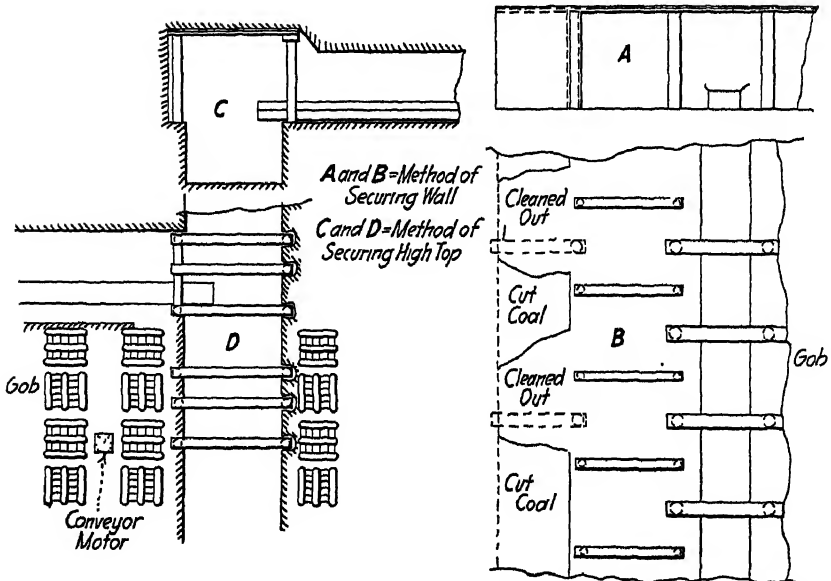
TIMBERING IN A LONGWALL MINE IN A MEDIUM PITCHING SEAM OF MEDIUM THICKNESS.
